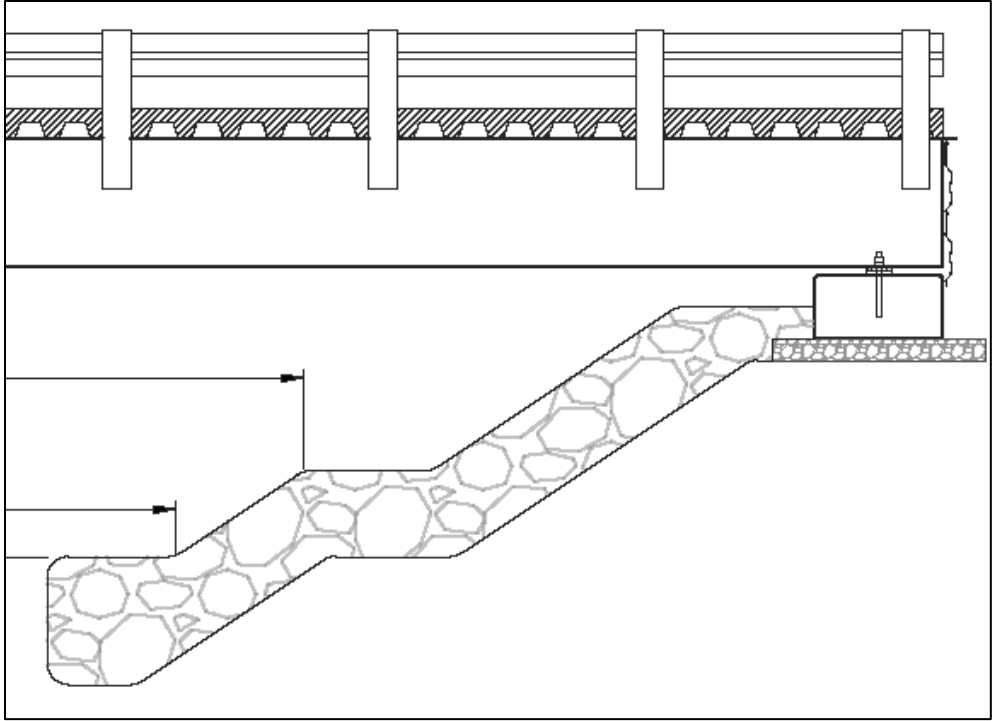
Cross section of the Boulder Creek bridge bank and structure stabilization design.
